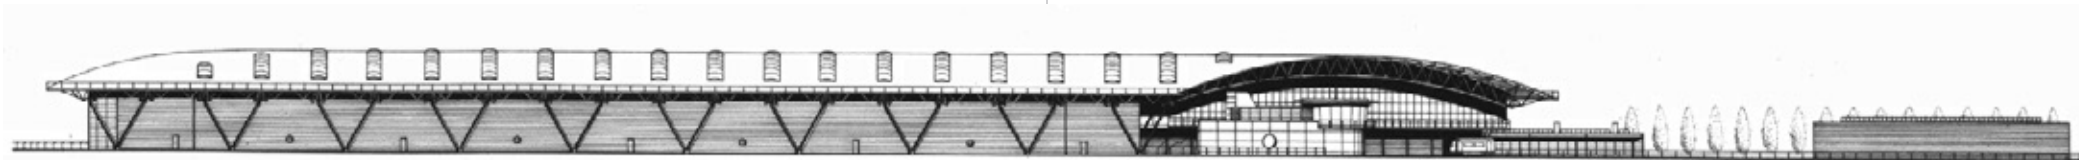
WilkinsonEyre's elevation of Stratford Market Depot
